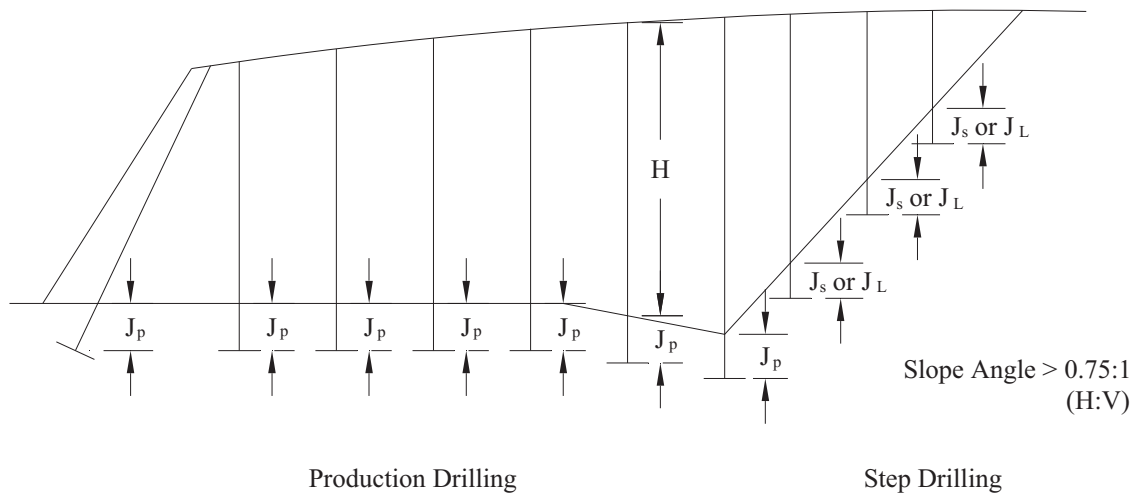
Illustration. Cross section of downhole and step drilling with sub-drilling techniques (modified from Cummings 2002).
